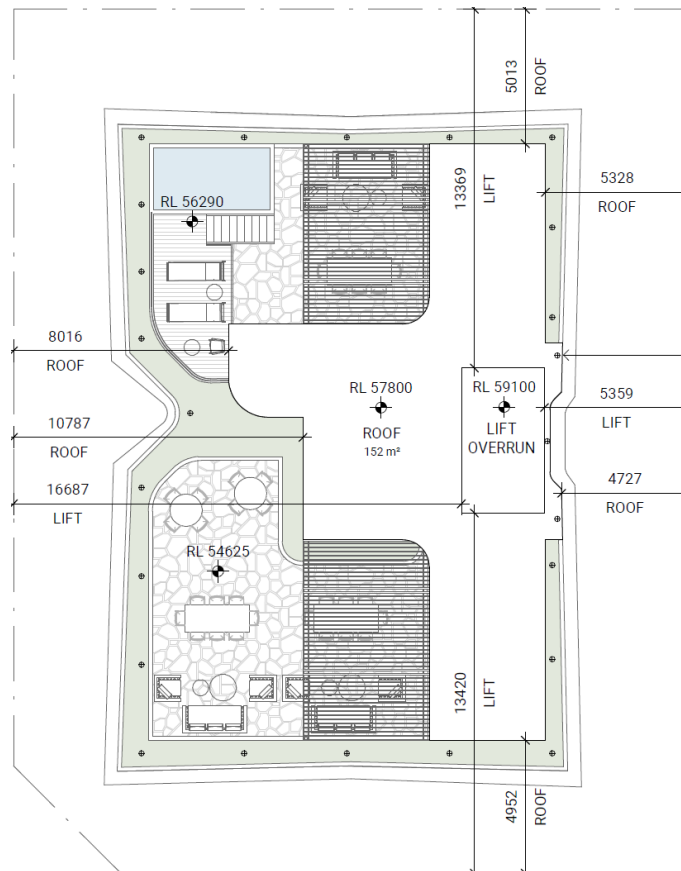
Proposed Roof Plan (Source: Plus Architecture)
